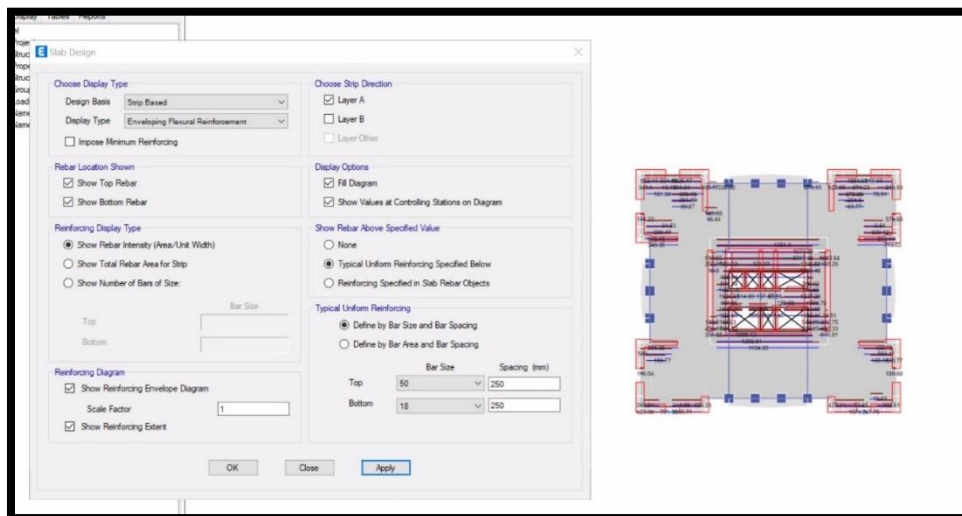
Bottom Reinforcement in X-Direction for 8th Floor
